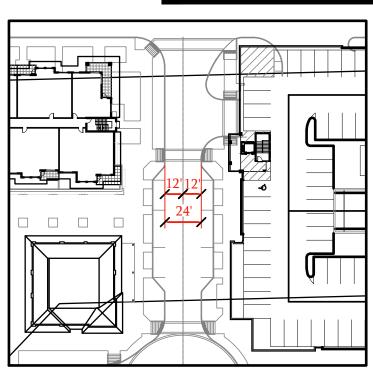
PEDESTRIAN STREET LOCATION PLAN
